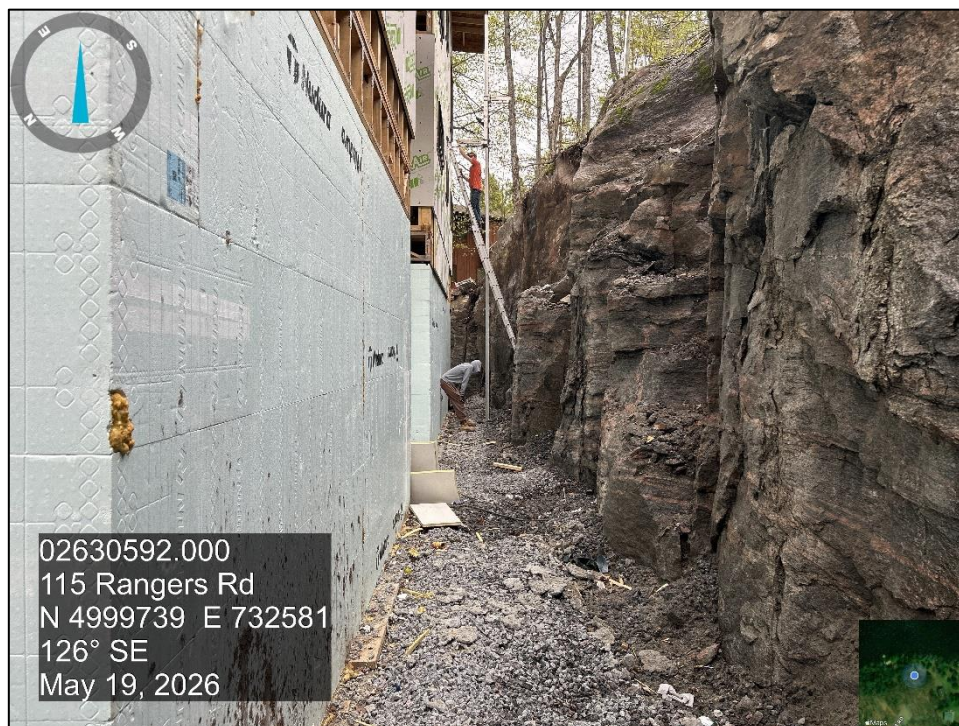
View of the slope face, looking east, showing the residential structure under construction and exposed bedrock. The granite bedrock shows little to no significant joints or fractures. The slope face is approaching near vertical.
